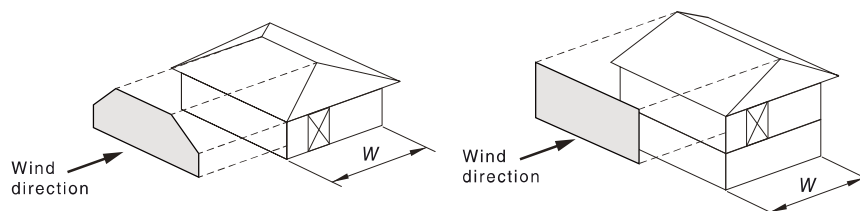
SIDE ELEVATIONS—SINGLE OR UPPER STOREY—GABLE OR HIP-ENDED ROOFS
